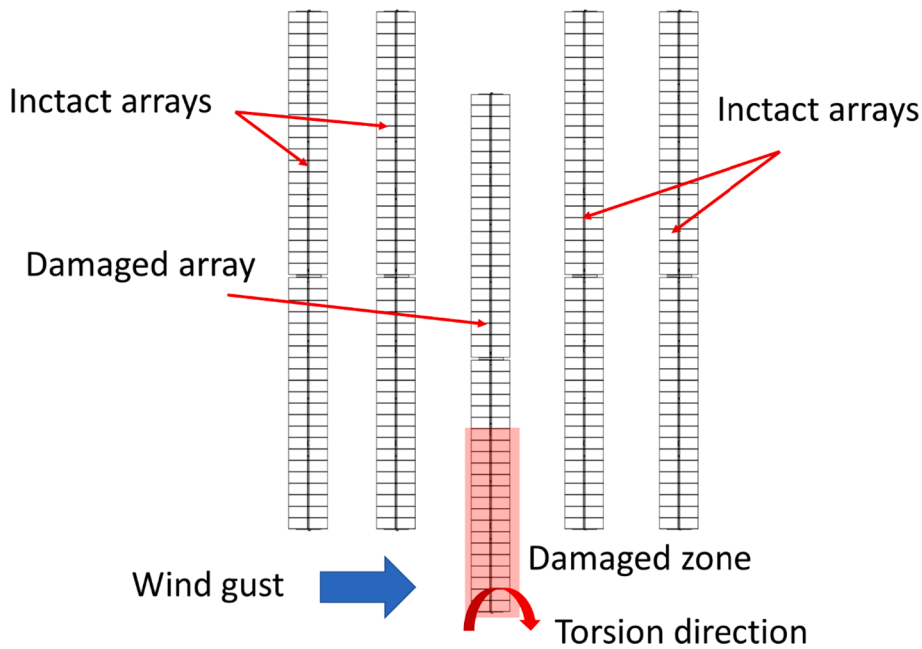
Disposition of the damaged solar tracker in the solar plant.
